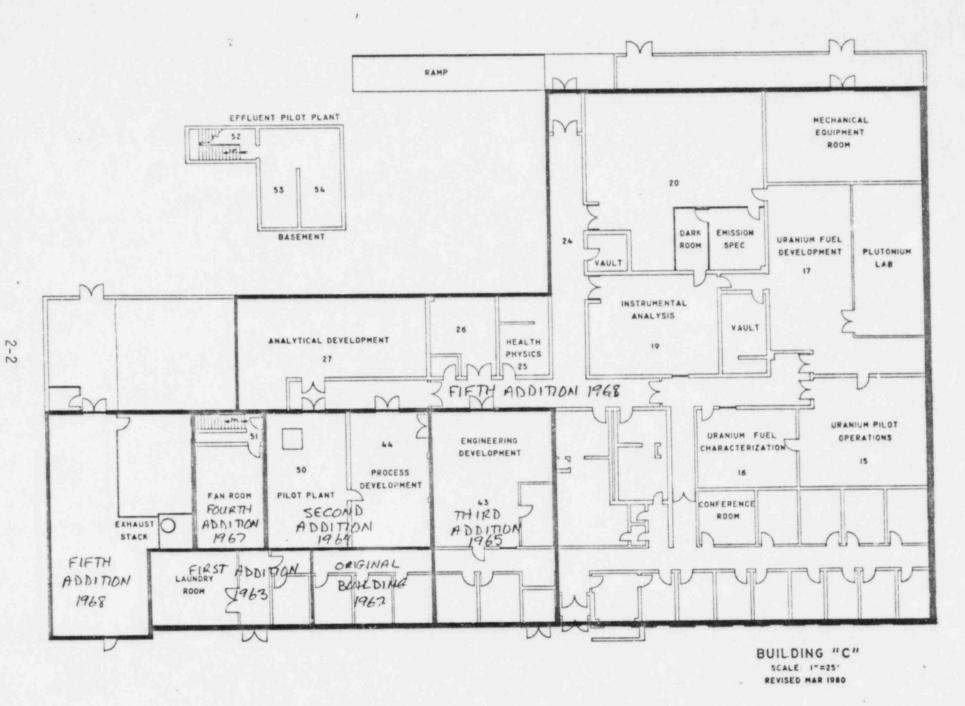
BUILDING C CONSTRUCTION SEQUENCE
